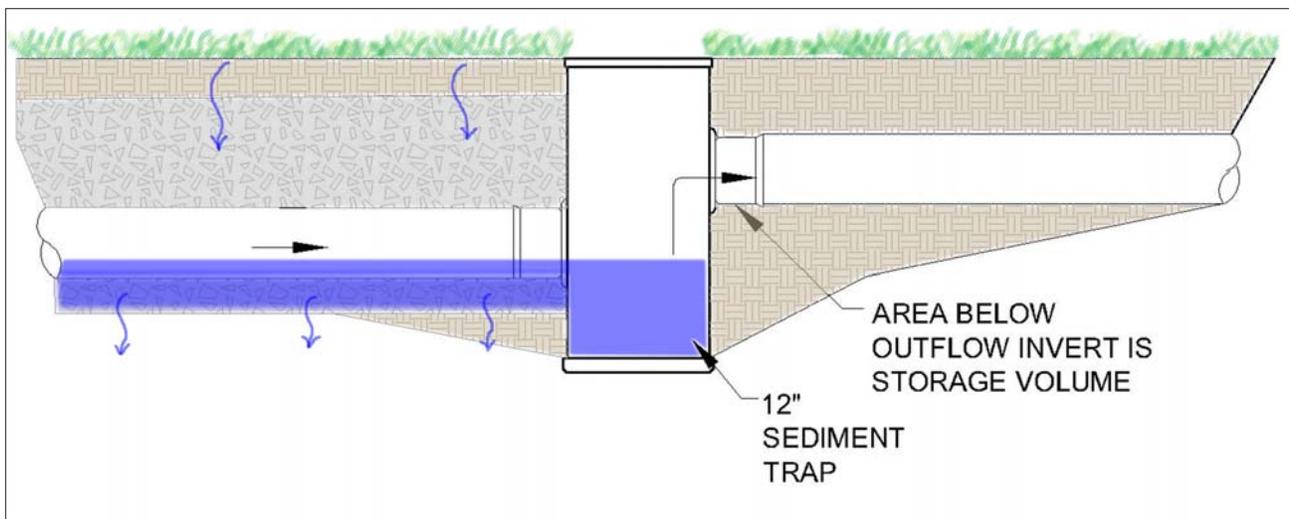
Profile of a typical outlet control structure from an infiltration trench.
